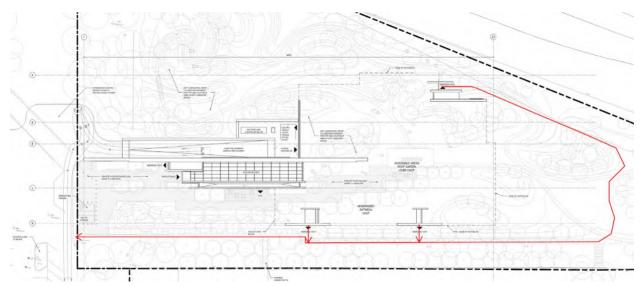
B2 Level Plan demonstrating a maximum 45m travel distance to an exit within the plant
